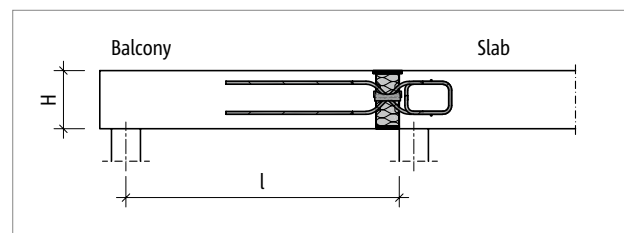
Schöck Isokorb® T type Q-E-W-VV: Static system
